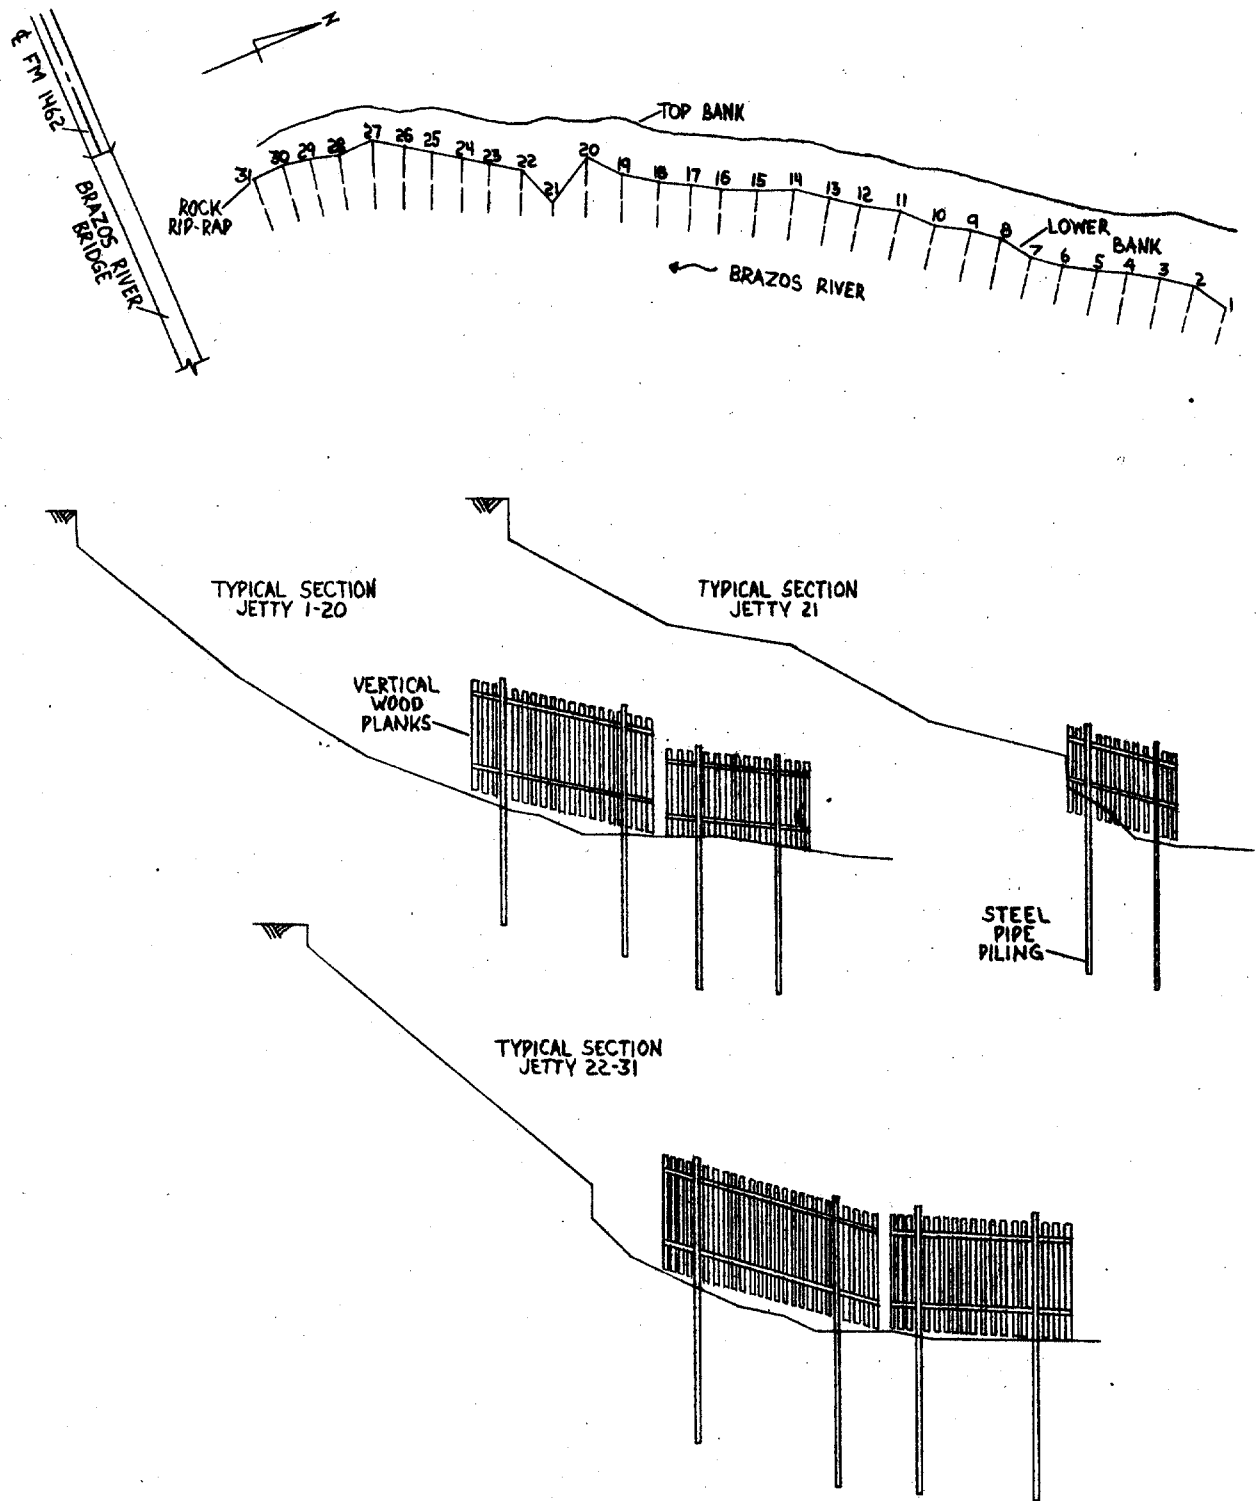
Plan for "spur jetty" installation at FM-1462 crossing, Brazos River.
